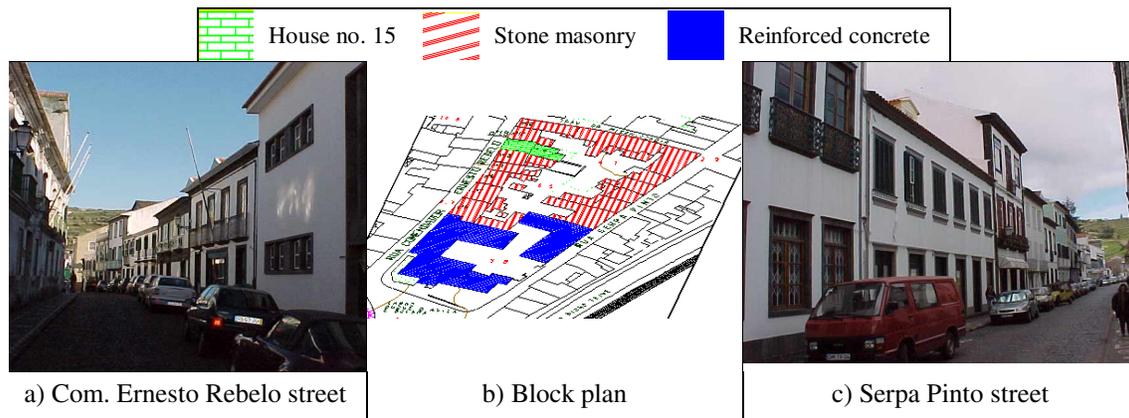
Block – Plan and surrounding streets: west (a) and east (c)
